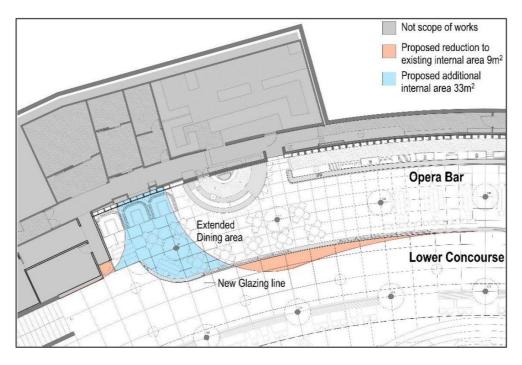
| Proposed Glazing Re-alignment (Source: Applicant's Architectural Design Statement)
